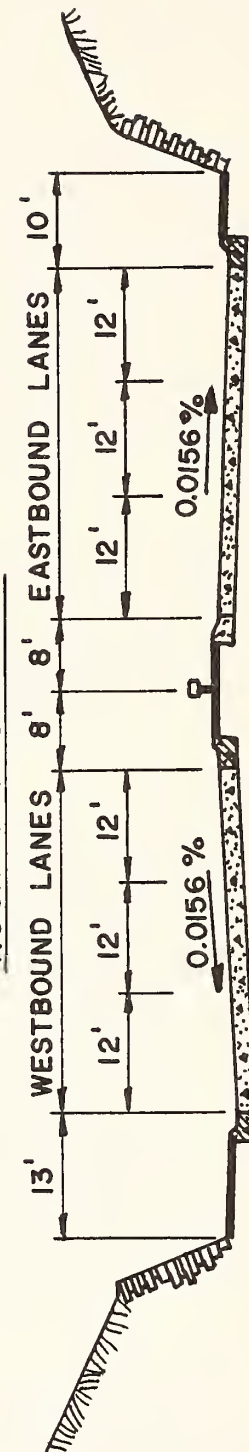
Schematic drainage plan, I-40 site, Nashville, TN
